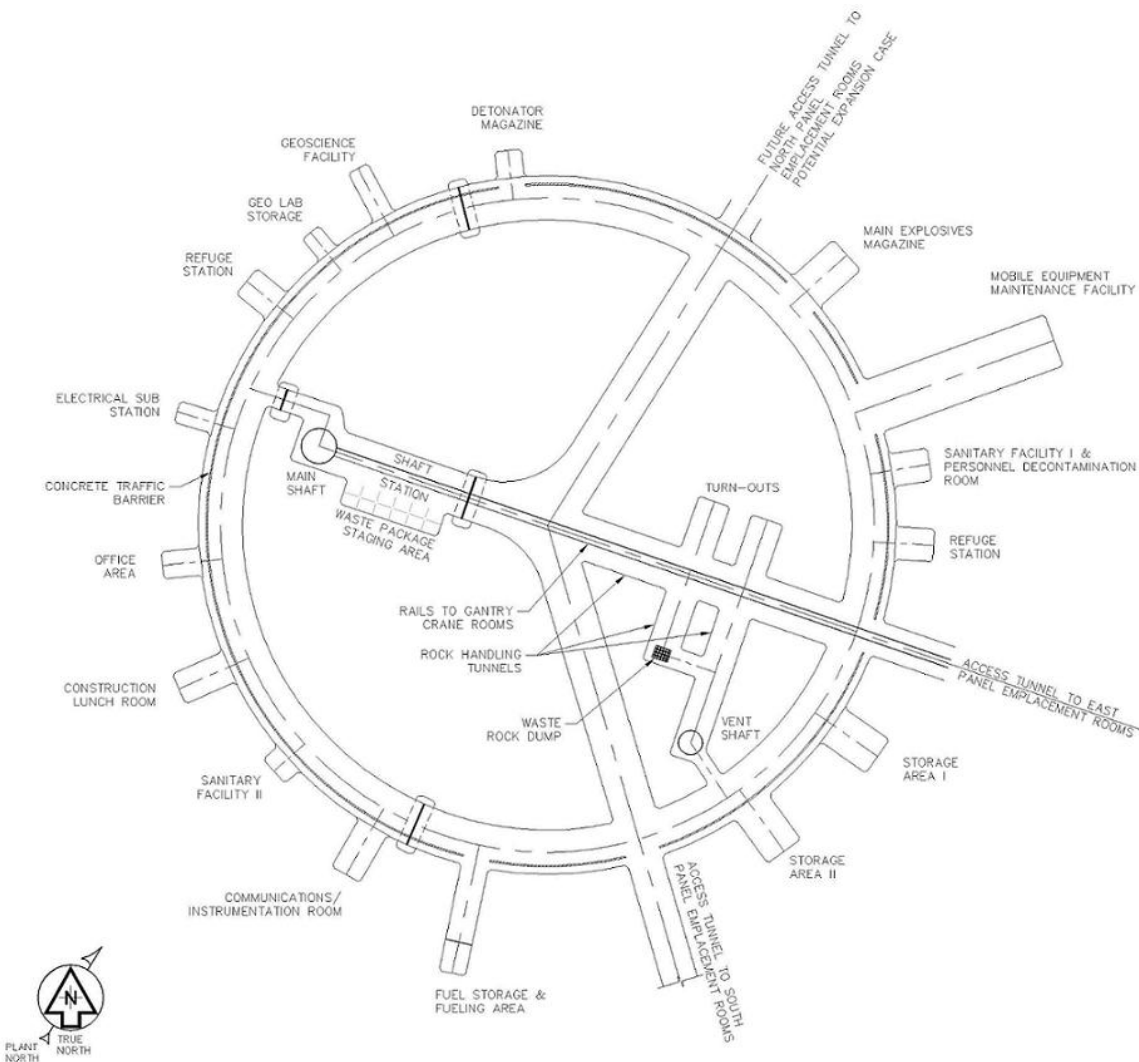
Layout of the Ring Tunnel (Hatch 2008)
